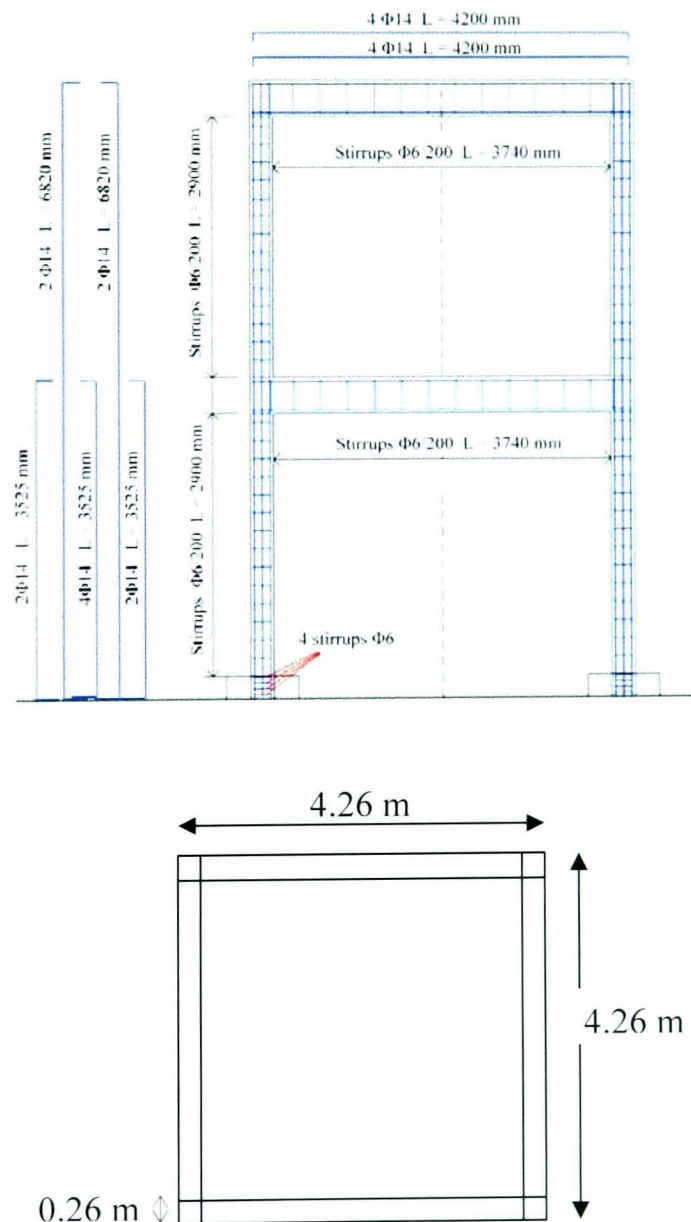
Reinforcement details of the elements (Chaudat et al., 2006) and plan view of the frame.
